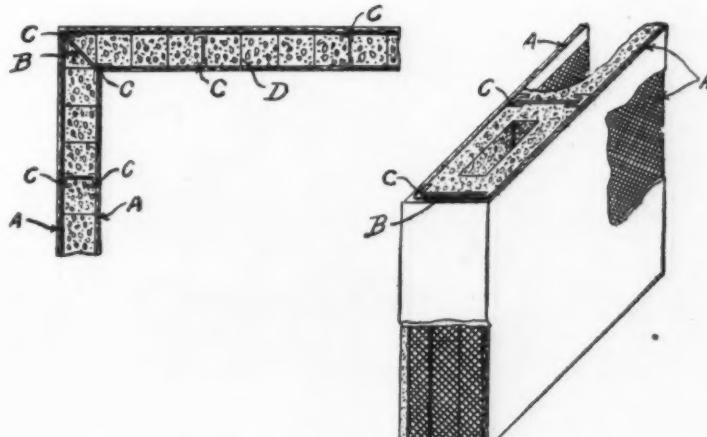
CONCRETE-METAL WALL CONSTRUCTION.
